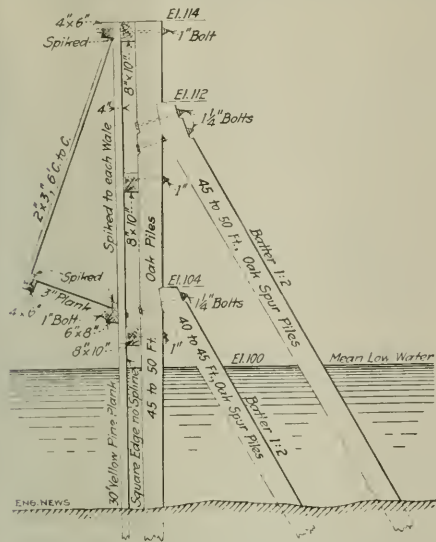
SECTION THROUGH OUTER BULKHEAD WALL,
